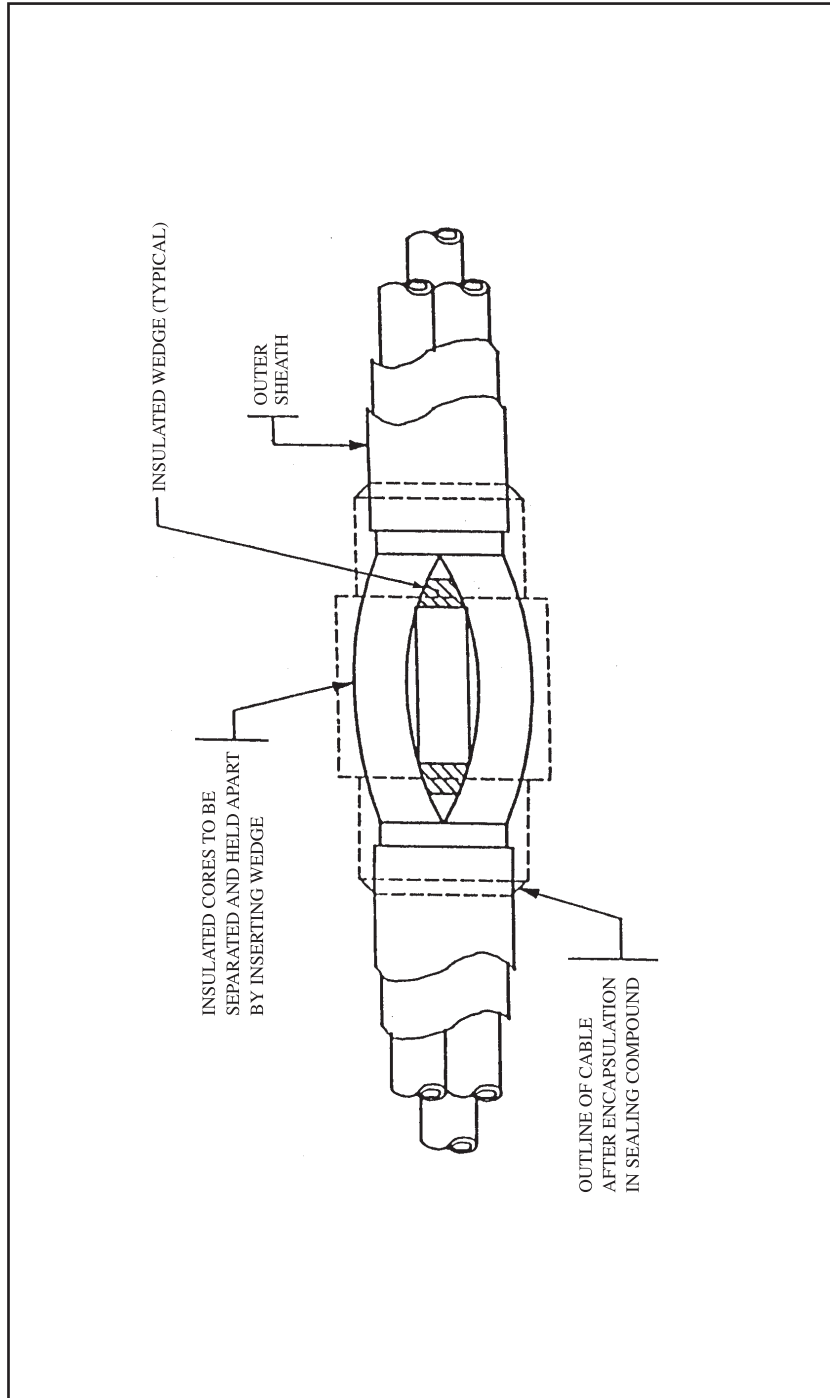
TYPICAL CONSTRUCTION OF CORE SEALING OF POWER CABLE AND BUNCH OF COAXIAL SOLID CONDUCTOR CABLES
